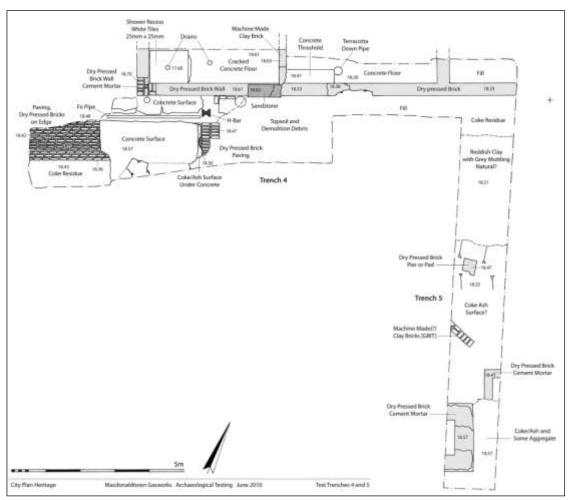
Detailed plan of Trench 4 and Trench 5; a bigger version of this plan in scale 1:50 is attached at Appendix 2
